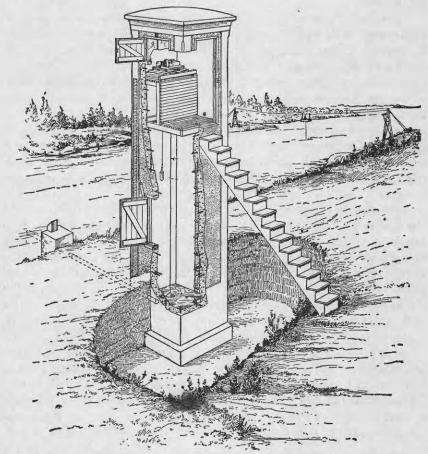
Typical river-measurement station showing concrete well and house for water-stage recorder and staff gages, cable, and car
